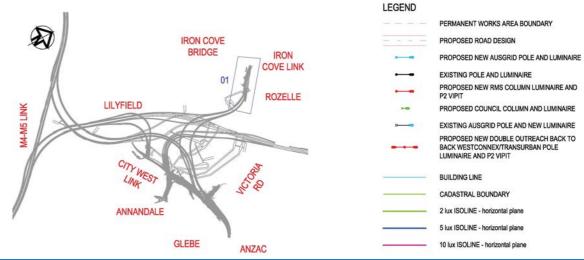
Iron Cove street lighting locations and lighting assessment
